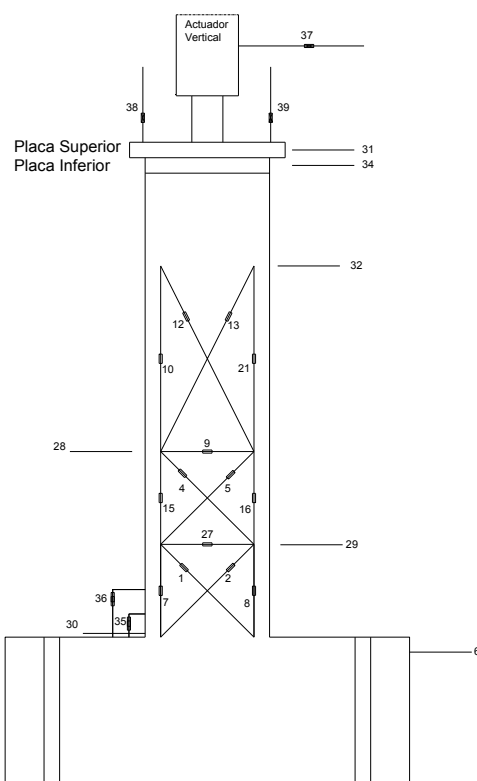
Disposition of the LVDT's (Delgado, 2009)
